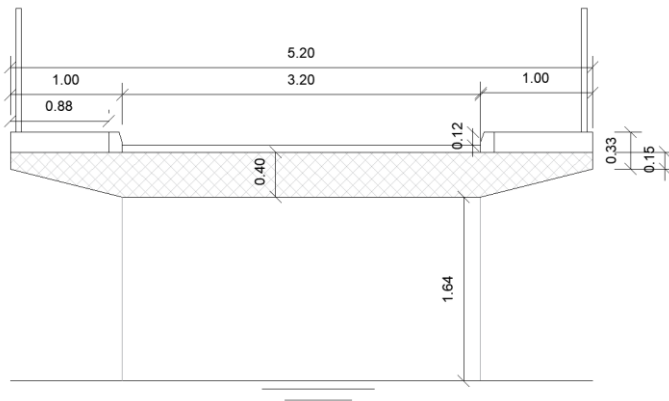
Cross-section of the repaired bridge - the second alternative solution
